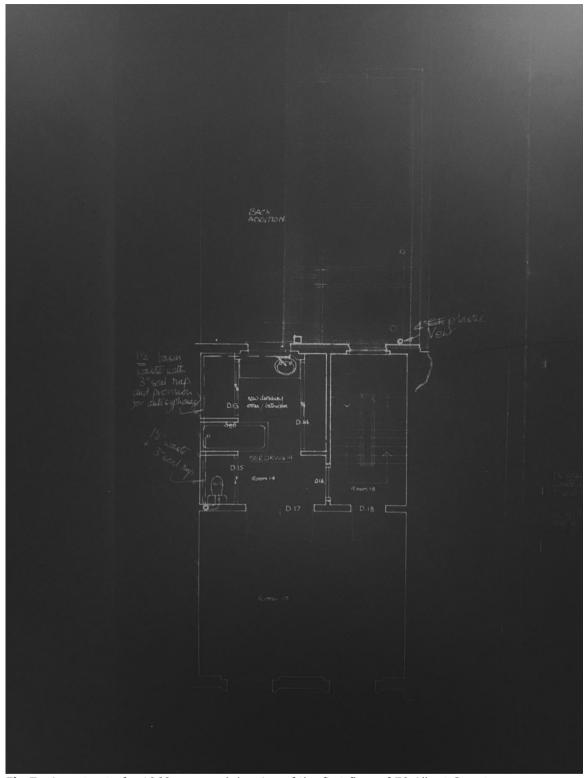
An extract of a 1968 proposed drawing of the first floor of 79 Albert Street.
